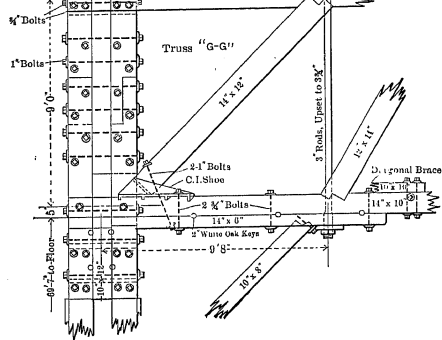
Howe Truss, Horticultural Building, Pan-American Exposition.
